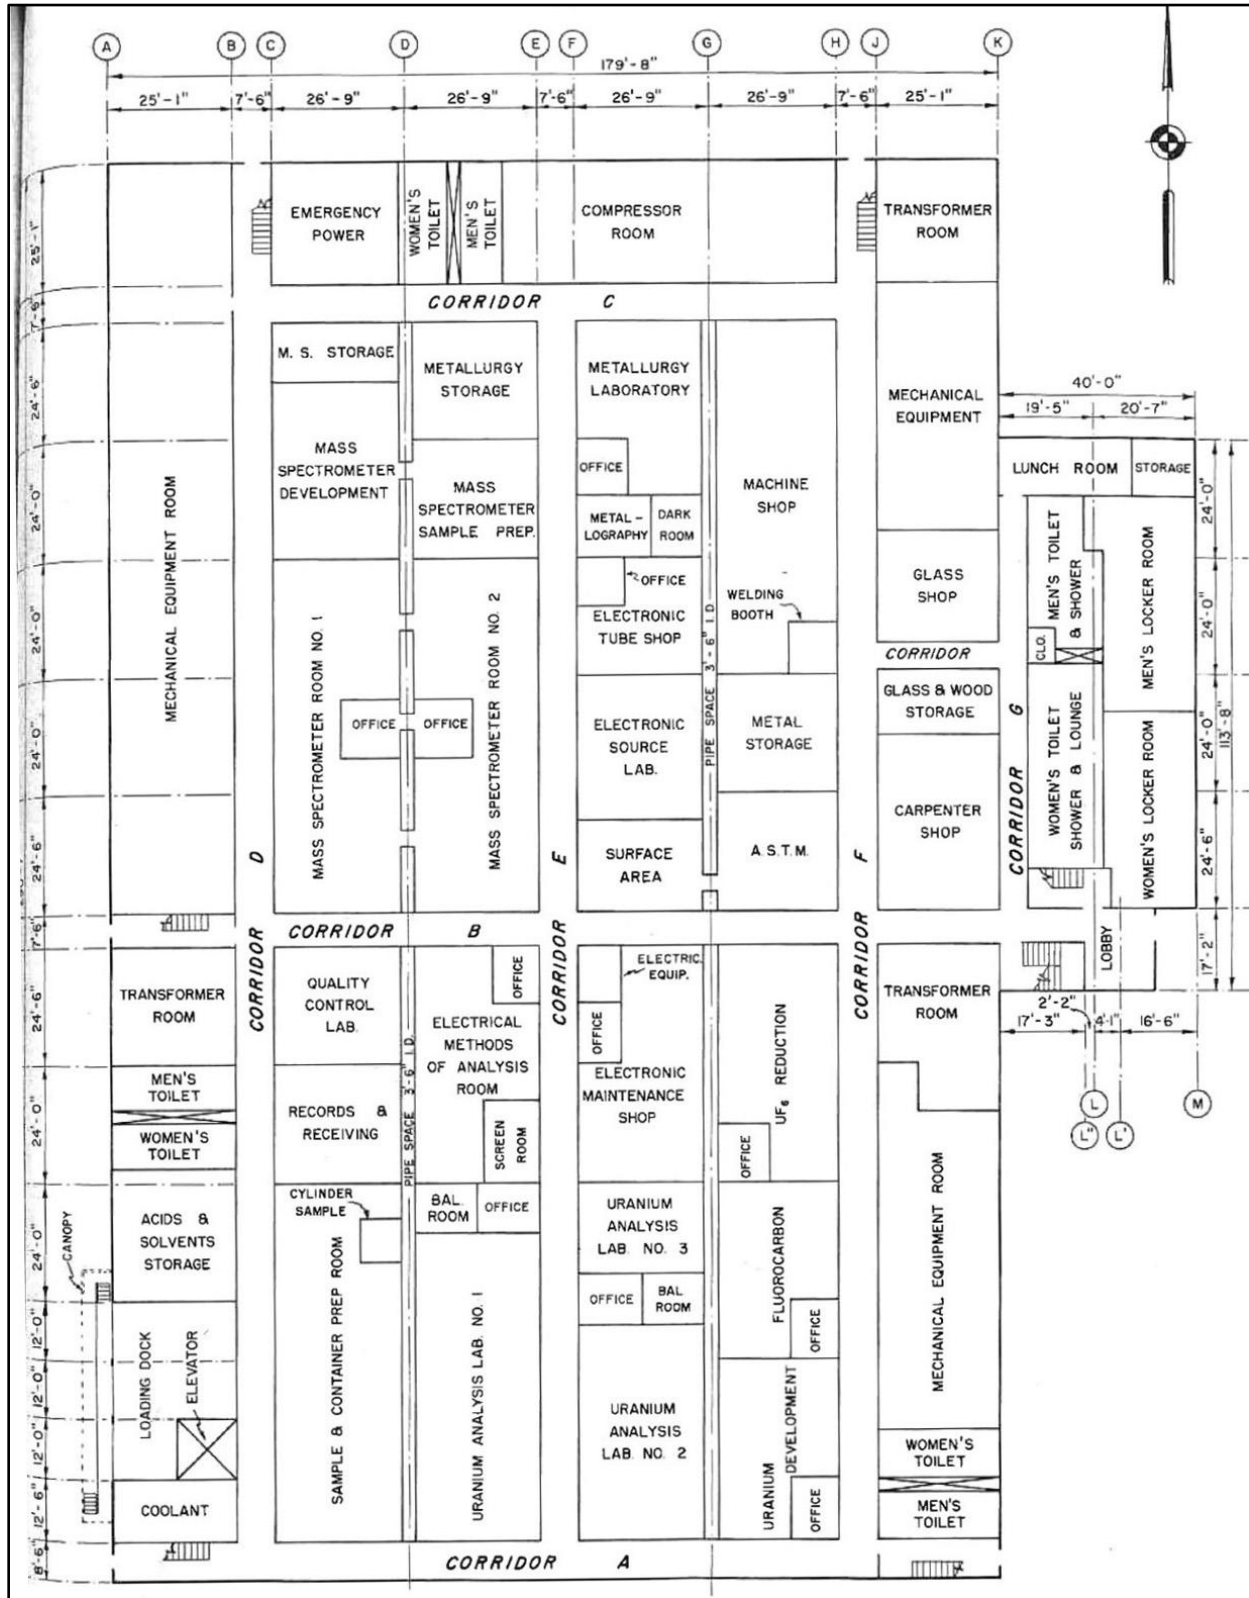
First Floor Layout of the X-710 Technical Service Building, Circa 1956
